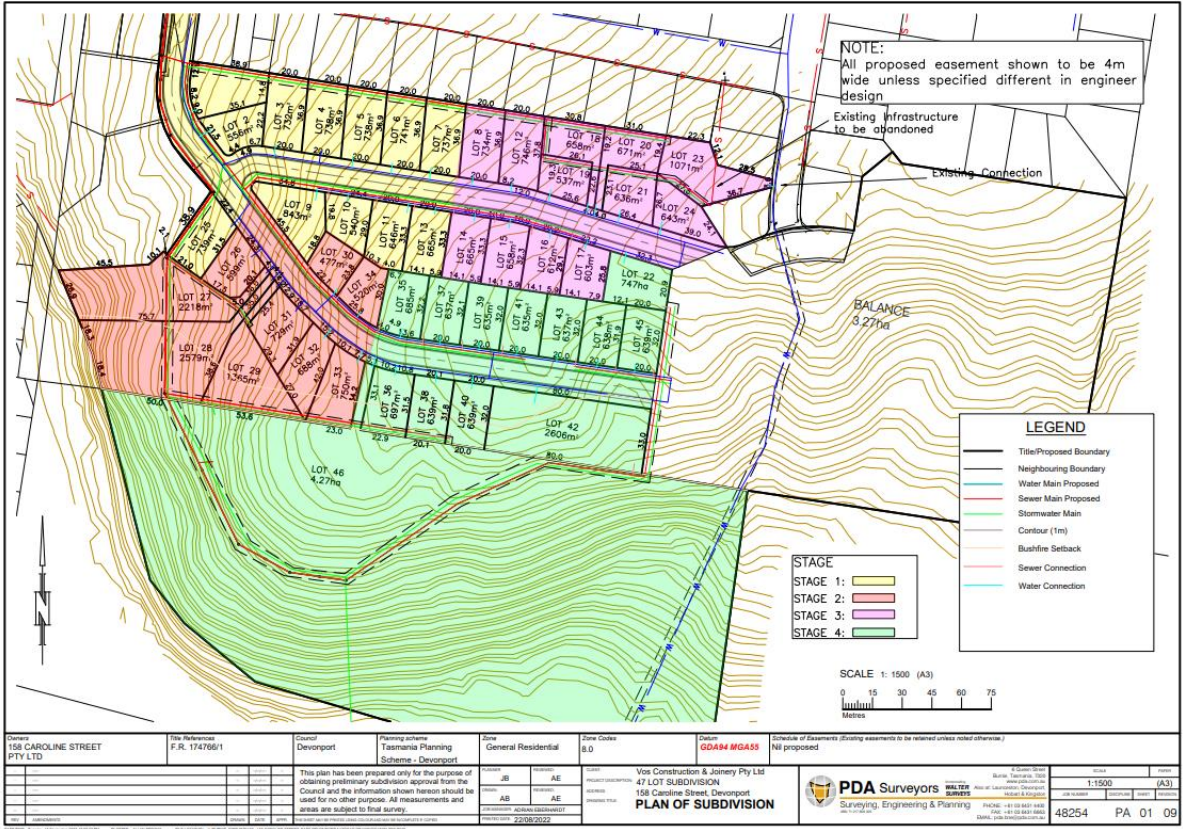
Subdivision stage plan (PDA Surveys, 2022)
